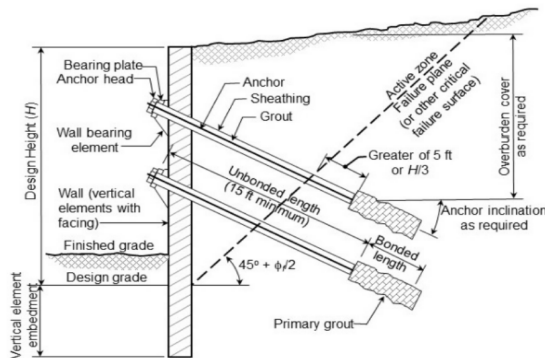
Anchored Wall Nomenclature and Anchor Embedment Guidelines
